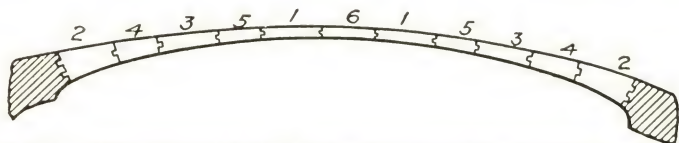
Diagram Showing Order of Placing Concrete in Bridge at Canal Dover, Ohio
